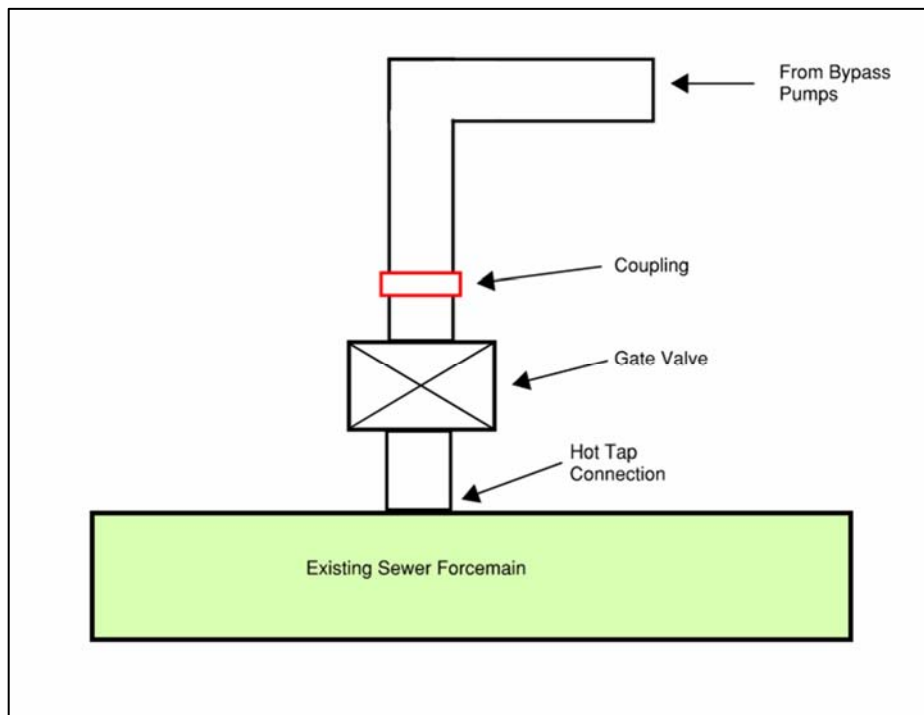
Sketch of Bypass Connection to Sewer Forcemain
